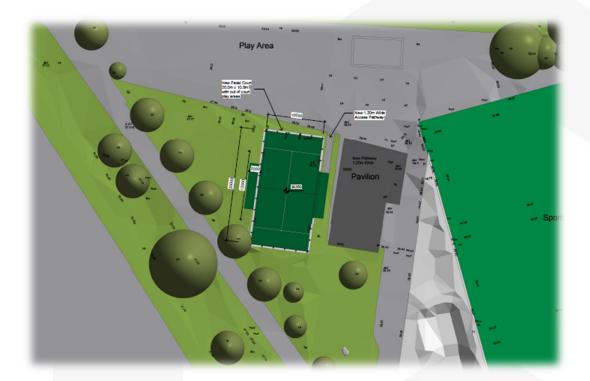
Proposed Layout, Drawing No. 2024 CAS 029 013 A (Sports Facility Planning & Design Ltd)
